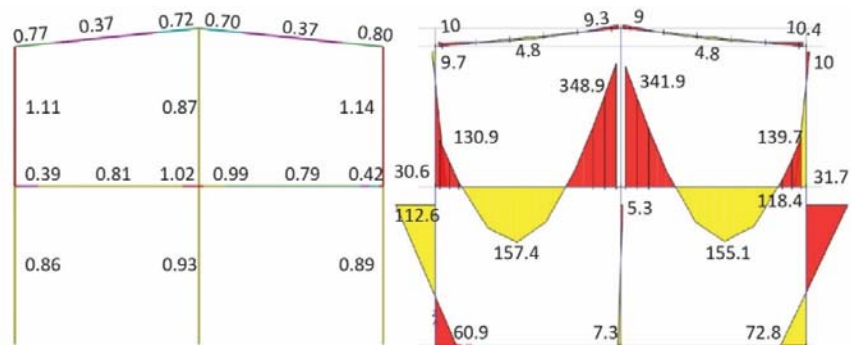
Utilization ratios of typical frame members at elevated temperature after recalculation of section forces.
